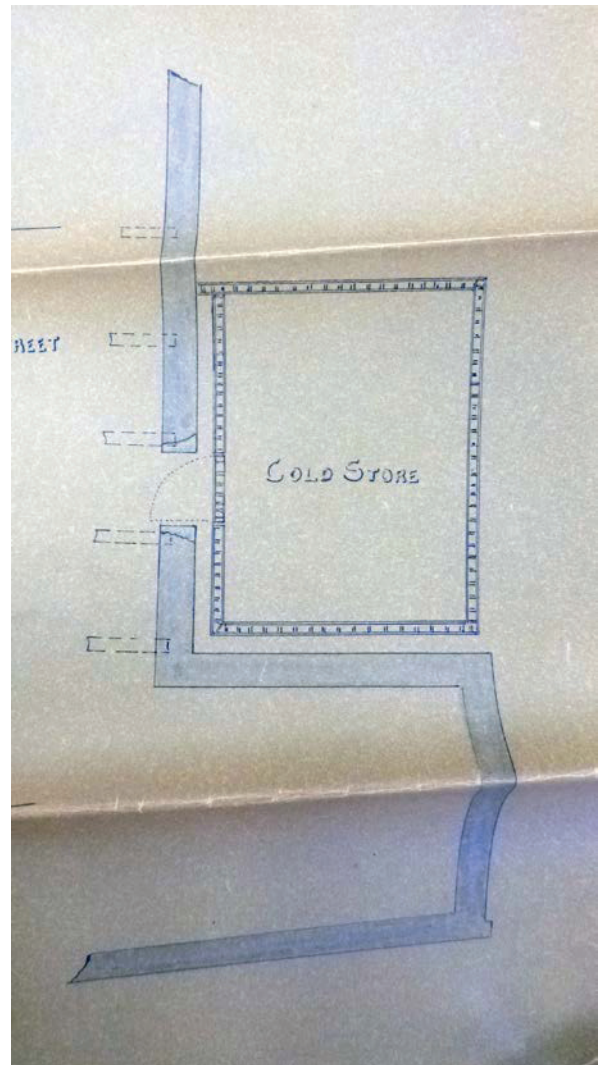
(right): Plan of the cold store for proposed addition to the Old Brewery, 1912
